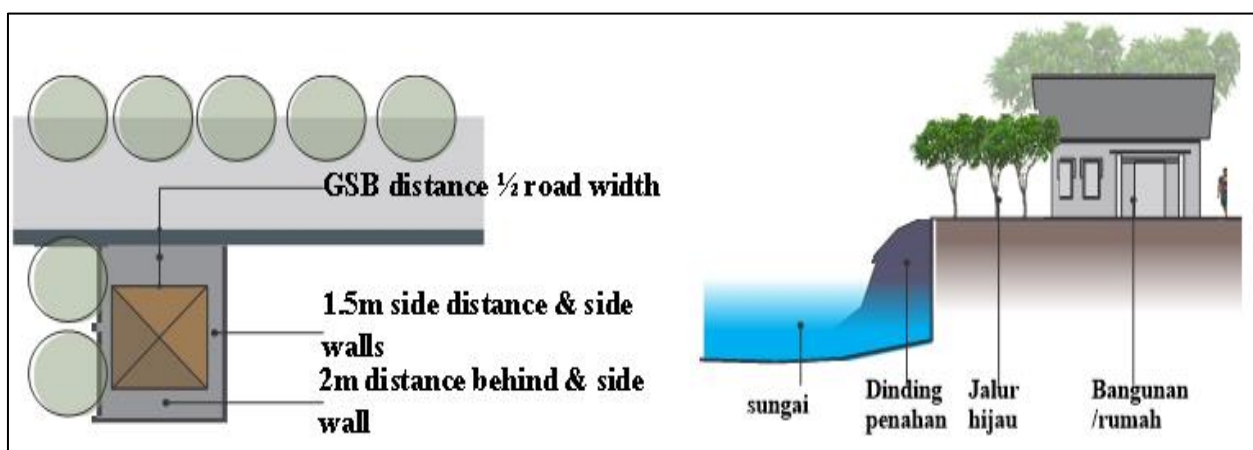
The Concept of Building Borderline (GSB) and River Border Design
